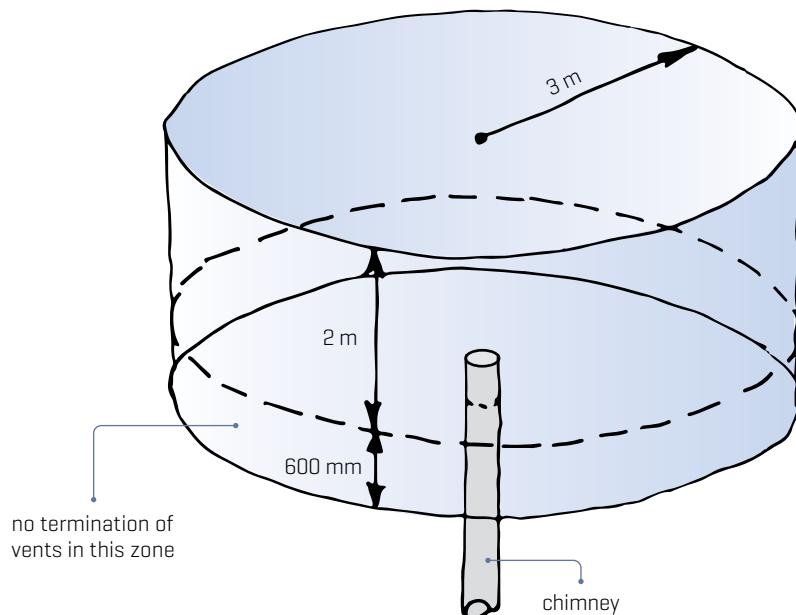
Termination point of vent 2 m above, 600 mm below and 3 m horizontally from a chimney.
